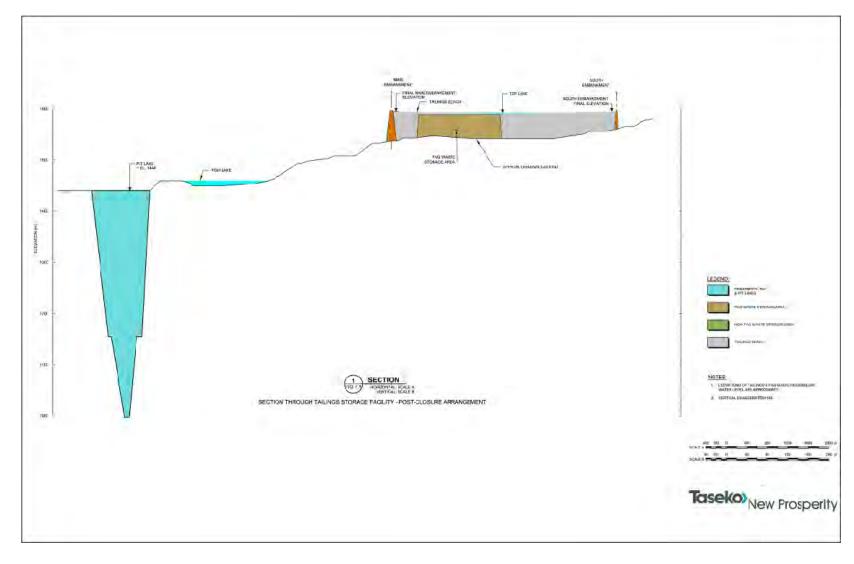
Long Section of Fish Creek Valley
